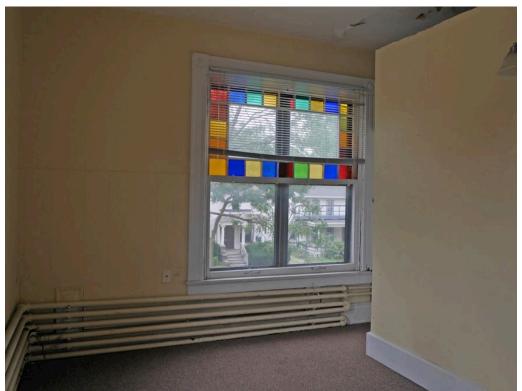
(image No. 16): Second floor front bedroom windows have the same colored panes as windows on the first floor. Note unusual radiant heating pipes.
